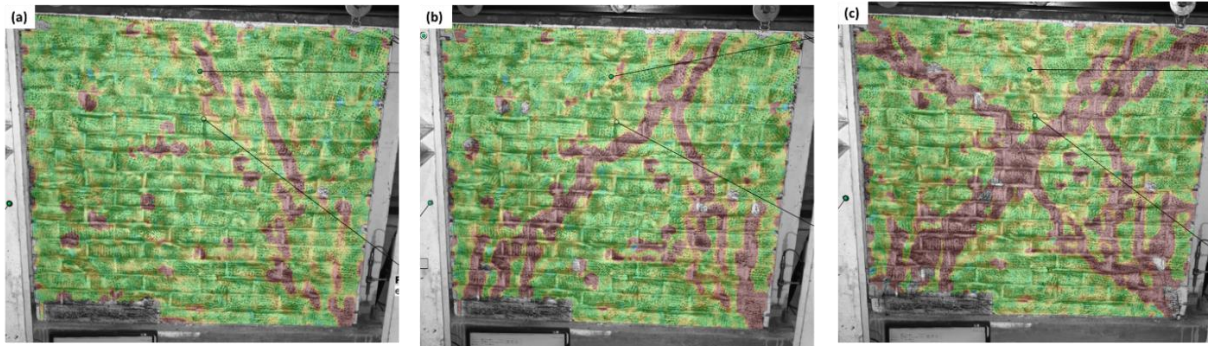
Initial crack formation (a), development of diagonal cracking (b), and (c) final crack pattern for masonry wall HC_116_B_30.
